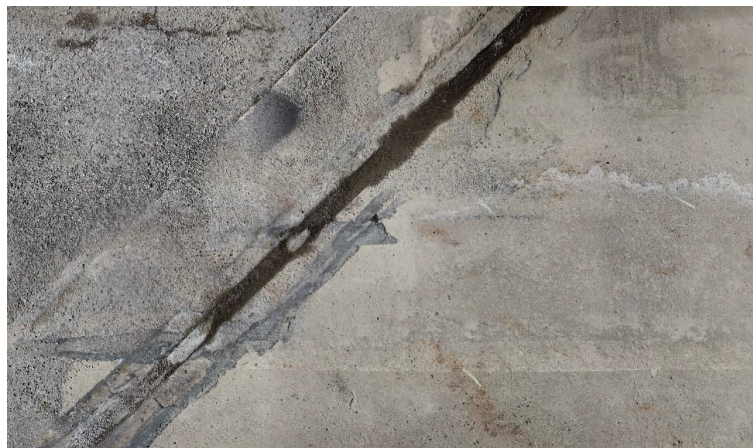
Image of a deck section around the joint of a bridge over Pohatcong River, Pohatcong Township, New Jersey.
